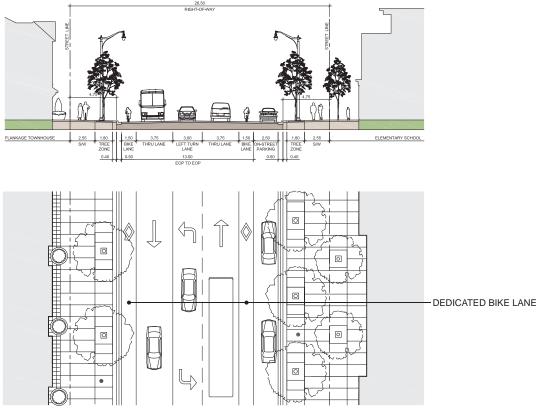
Conceptual typical Spine Road treatment (26.5m R.O.W.) within mixed-use nodes with hard urban streetscape treatment, bike lanes and dedicated on-street parking on one side.
